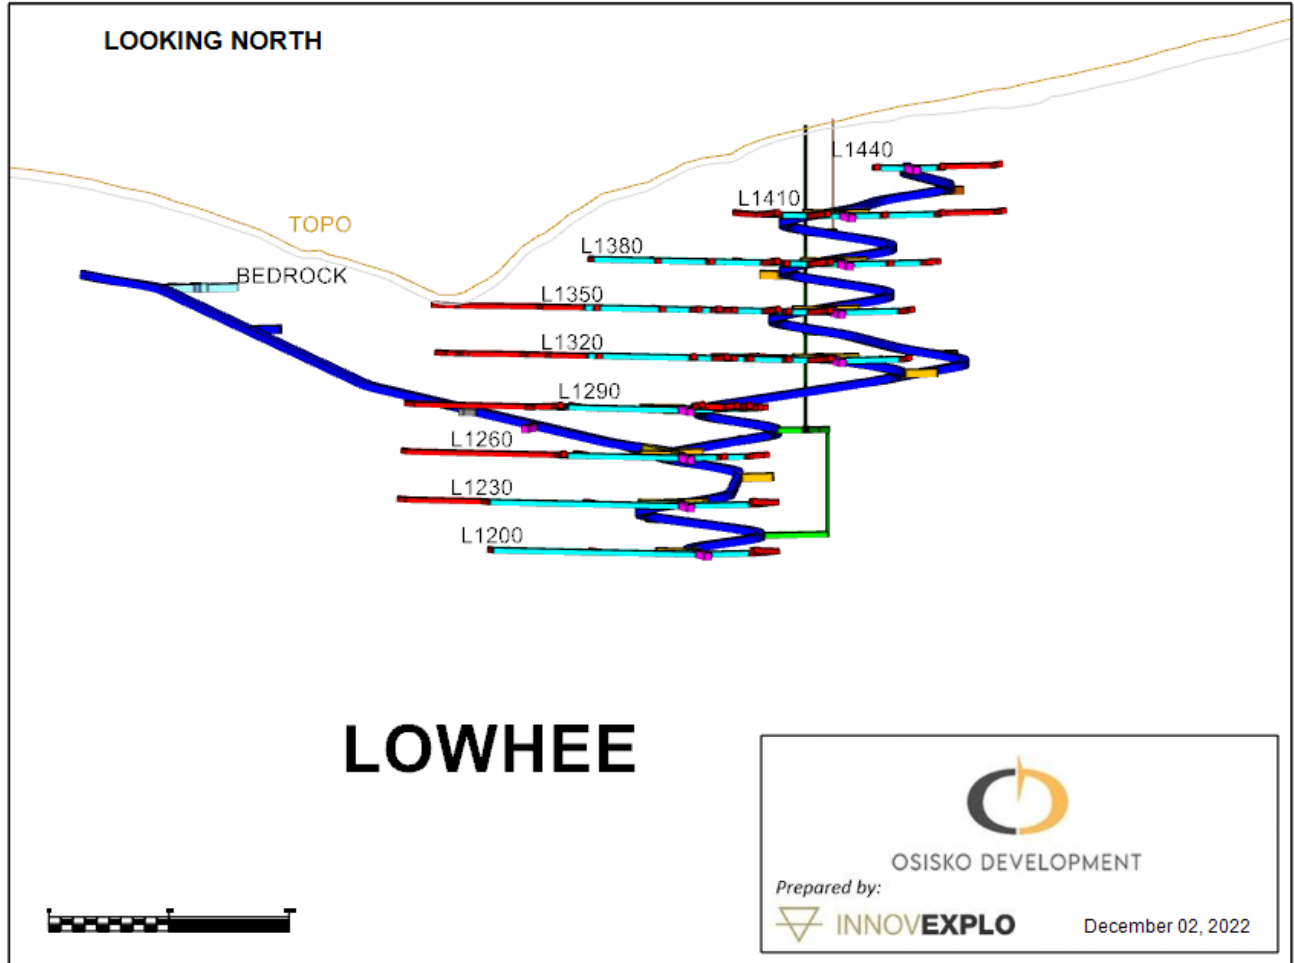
Longitudinal section of Lowhee Zone looking north
